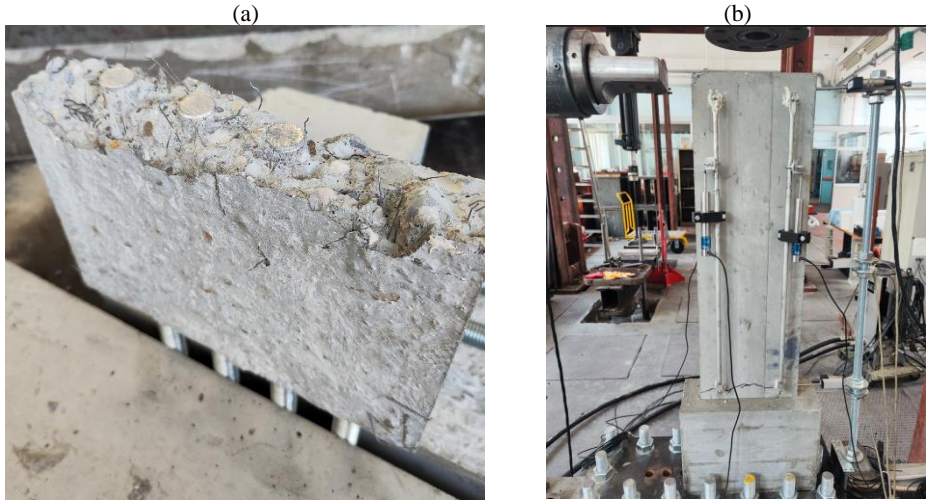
(a) Failure of the wall subjected to bending and shear; (b) the collars used to reinforce the wall in the foundation.
